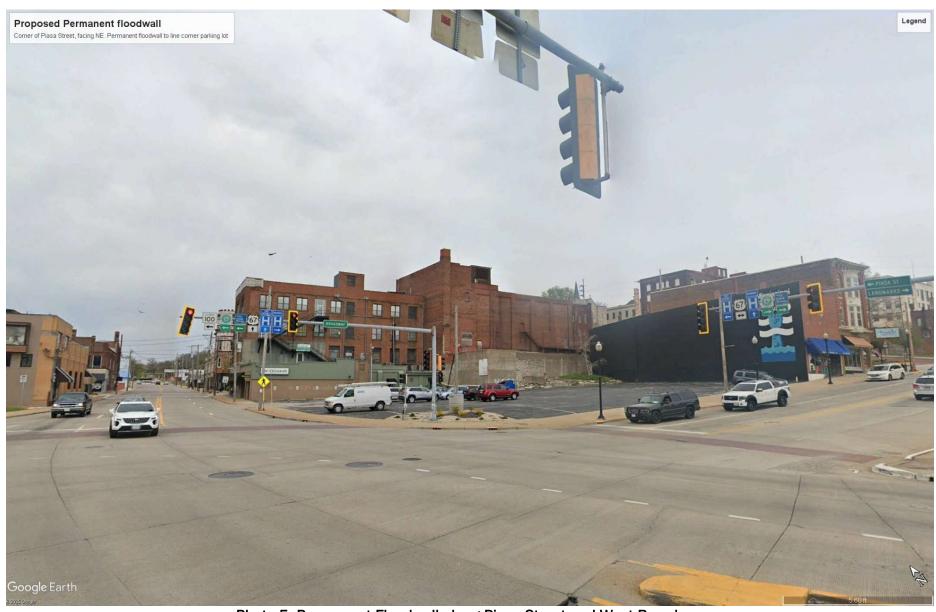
Permanent Floodwall along Piasa Street and West Broadway along the perimeter of the corner parking lots; facing northeast
